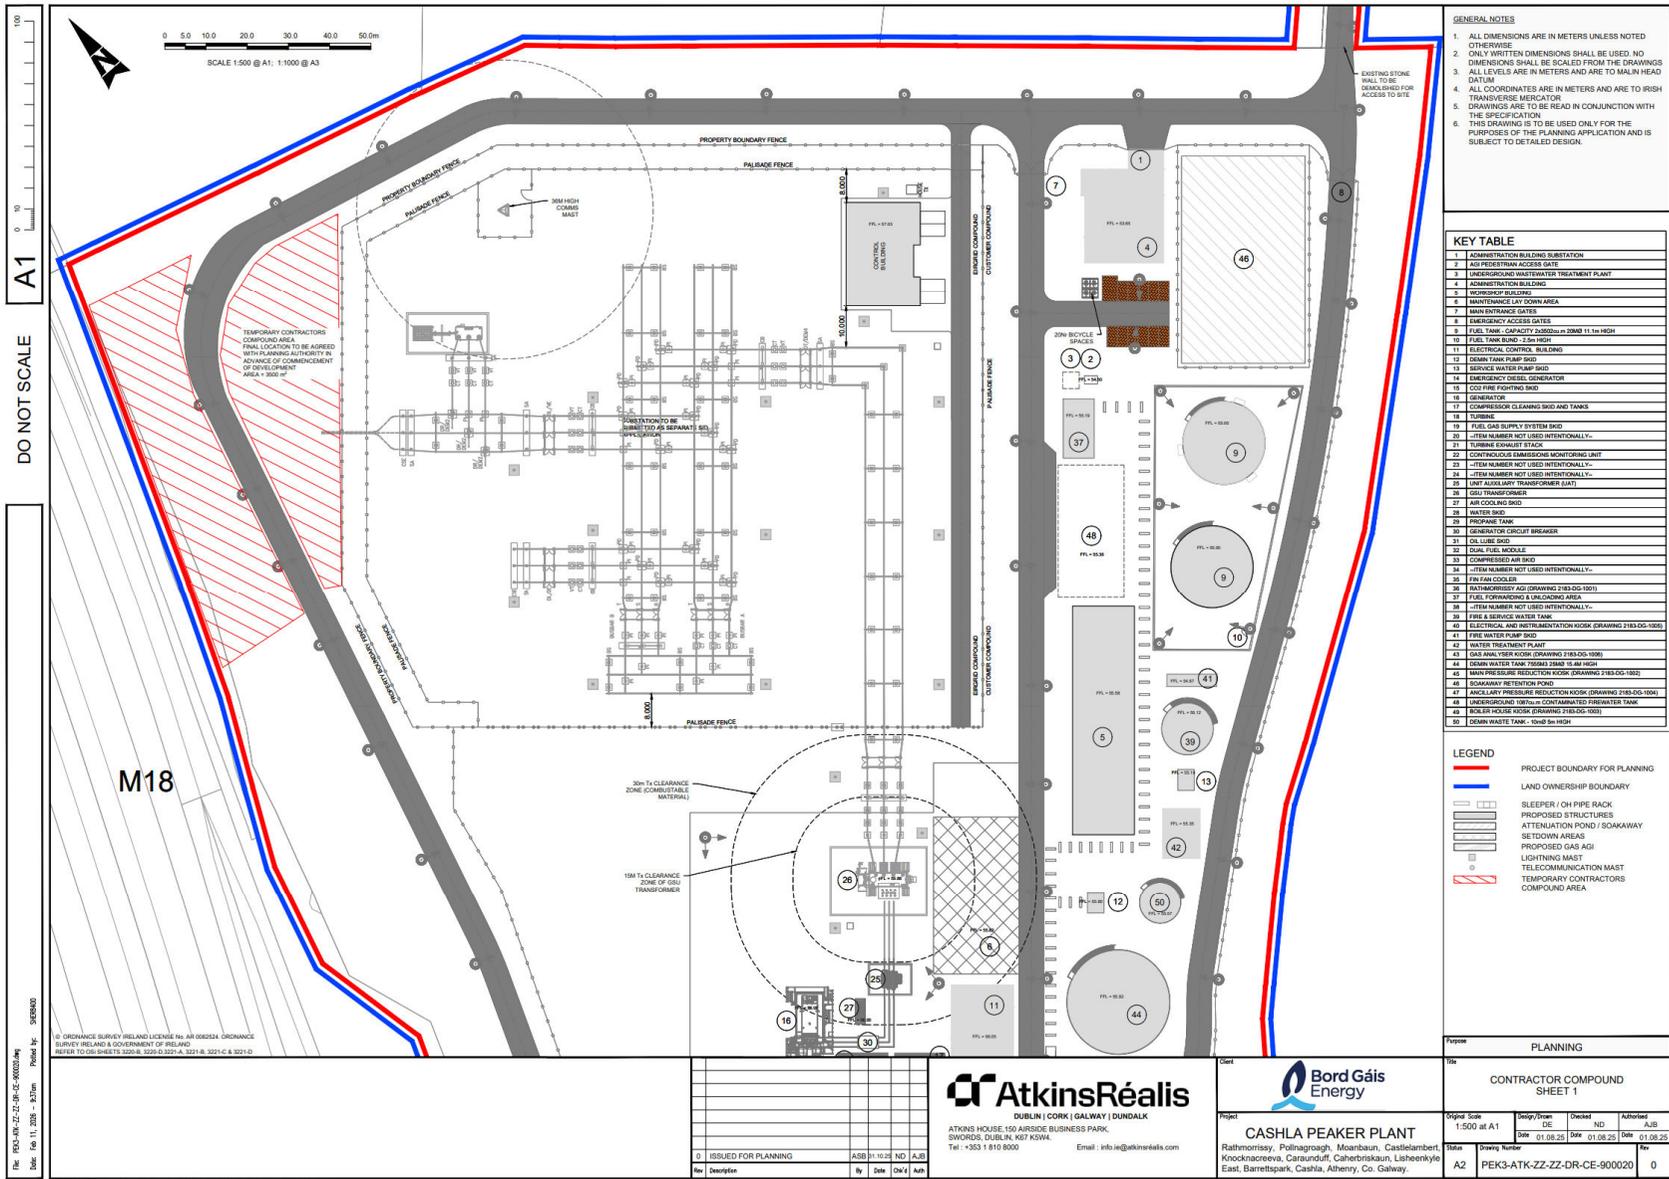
Proposed Construction Compound Locations – Indicative (see red hatching) – Sheet 1
